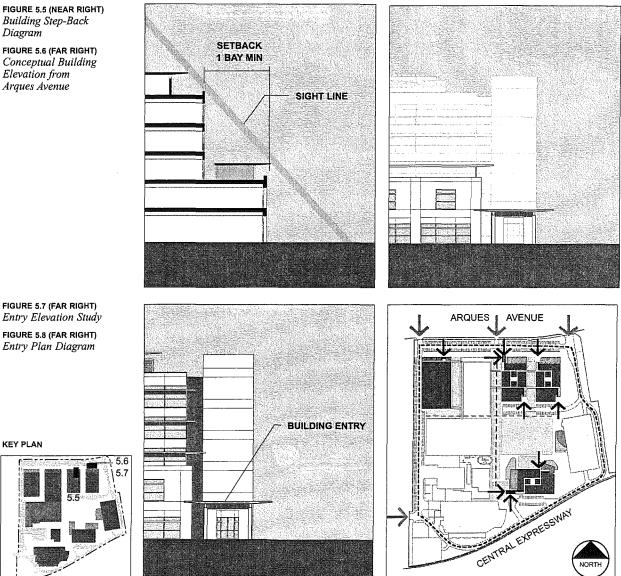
(FAR RIGHT) Entry Elevation Study FIGURE 5.8 (FAR RIGHT) Entry Plan Diagram
